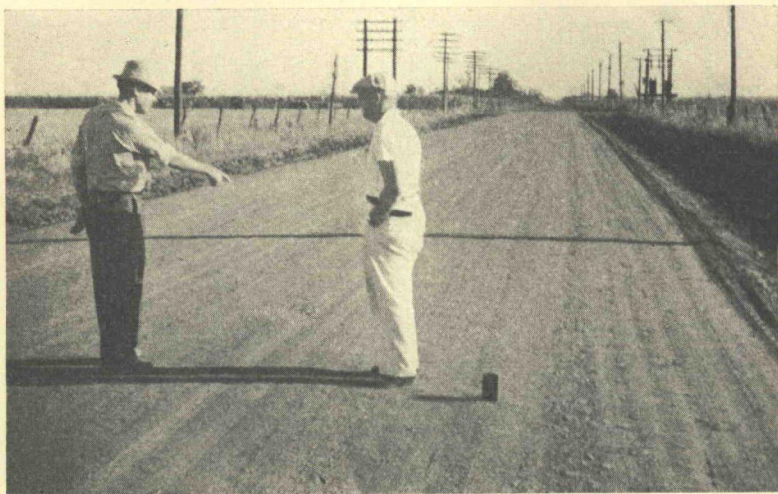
Completed base. Early morning inspection of previous day's run before application of prime. Iowa photo.
